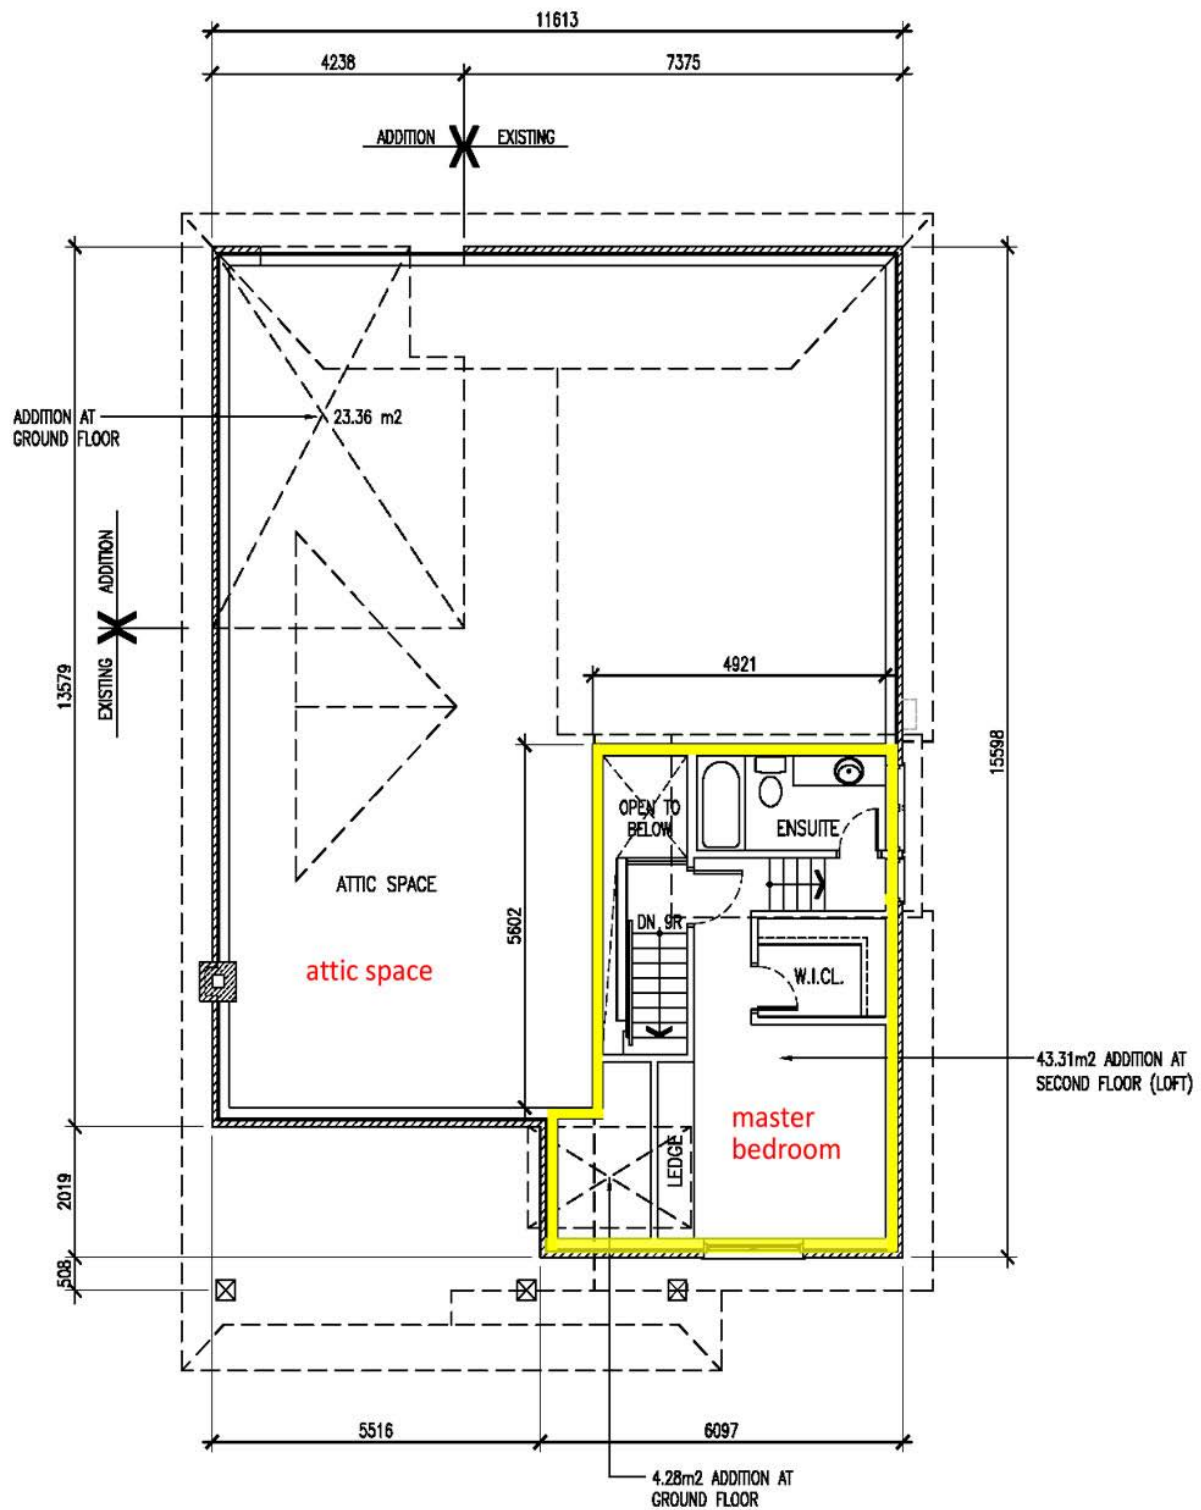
Proposed second floor plan, with new wall construction highlighted and text annotations by the author of this report.
